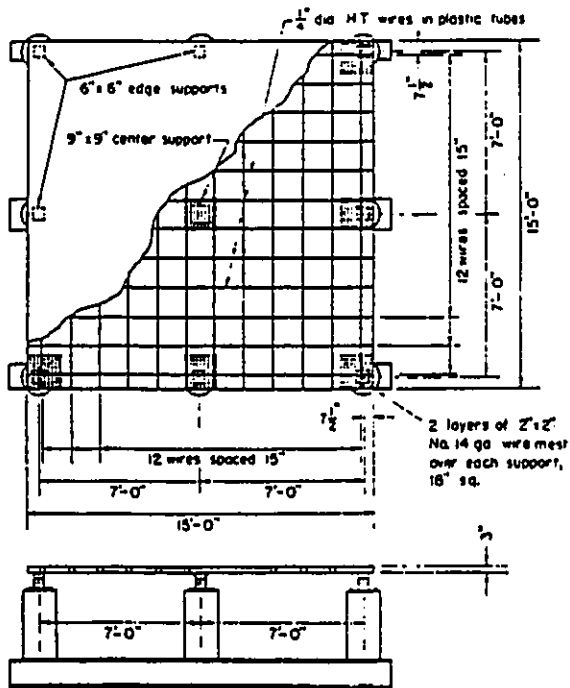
Plan, elevation and typical cable profile of Scordelis's test slab (1959)
